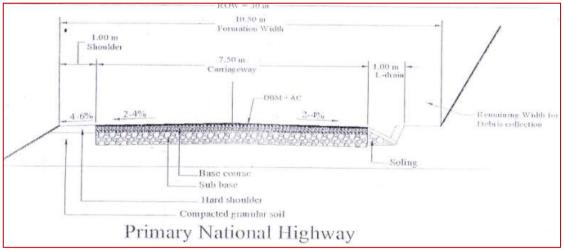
(3): Revised drawing No. 2: Pavement drawing followed by RO Thimphu and Trongsa
